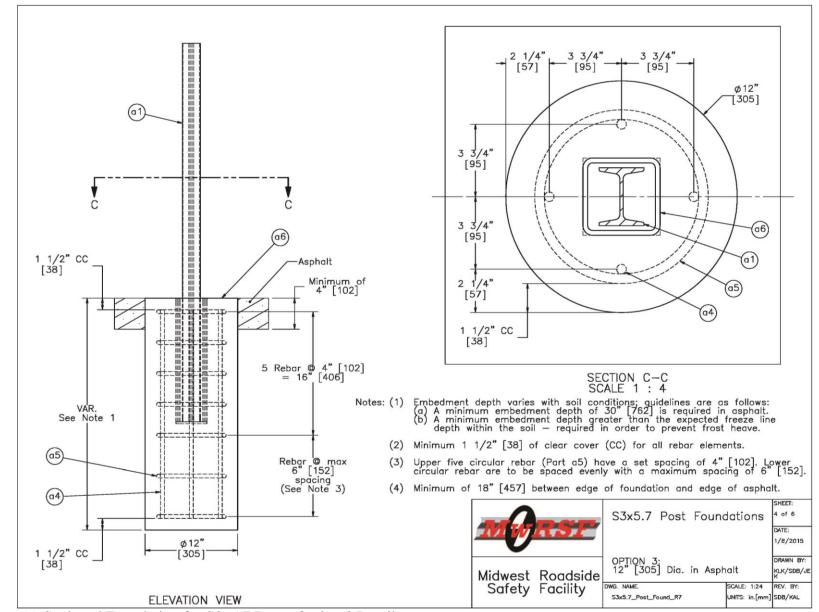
Socketed Foundation for S3x5.7 Posts, Option 3 Details
